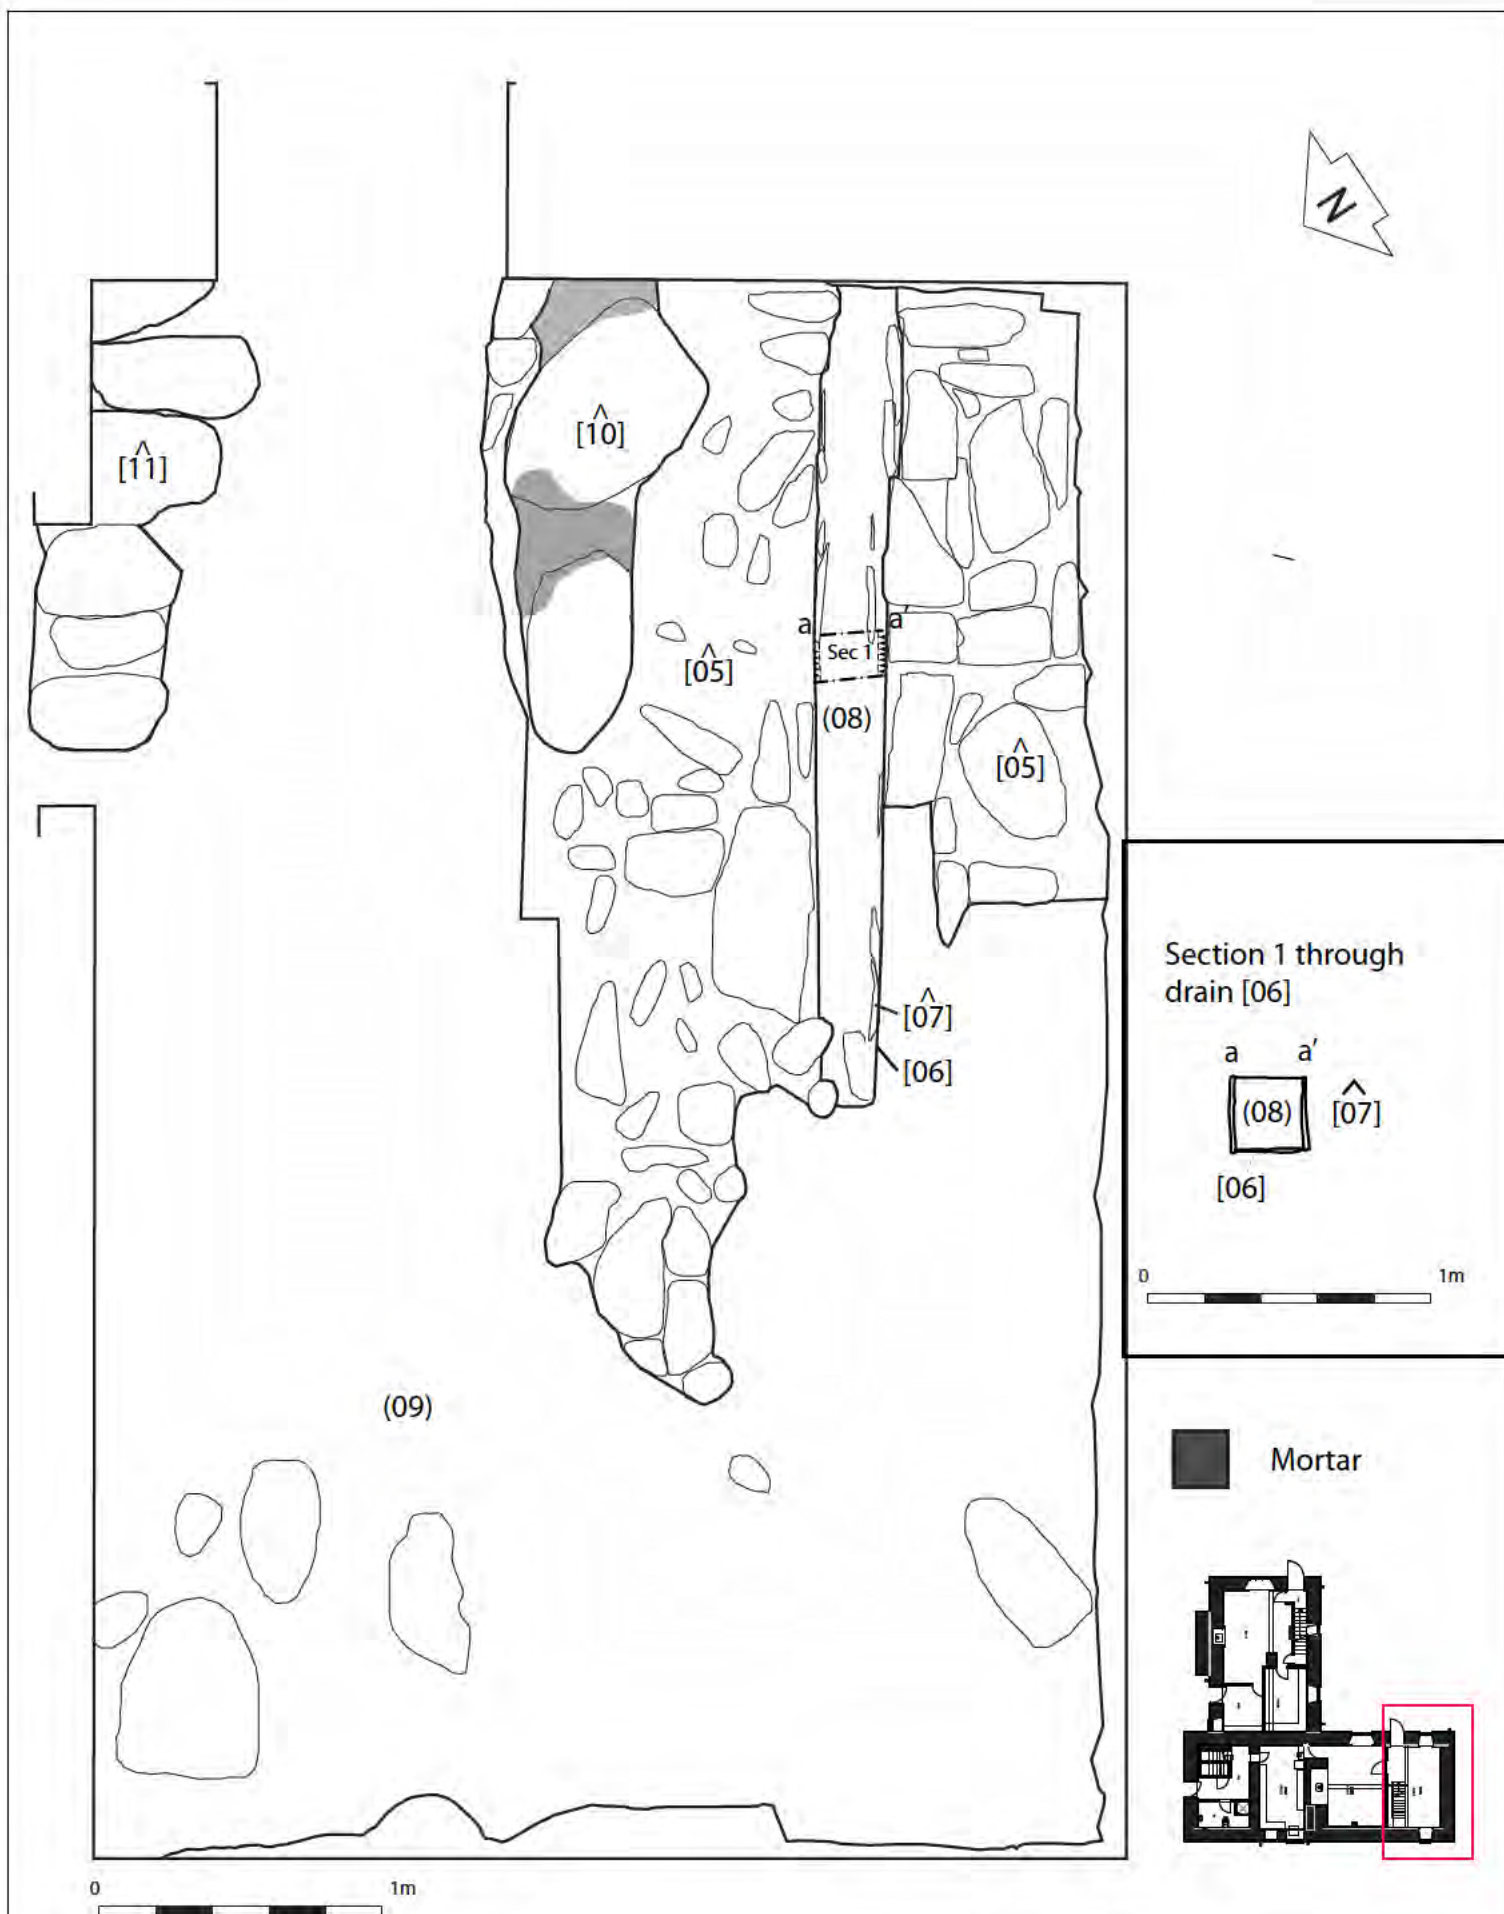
Plan of floor surfaces below concrete flooring (04) within the dining room.
